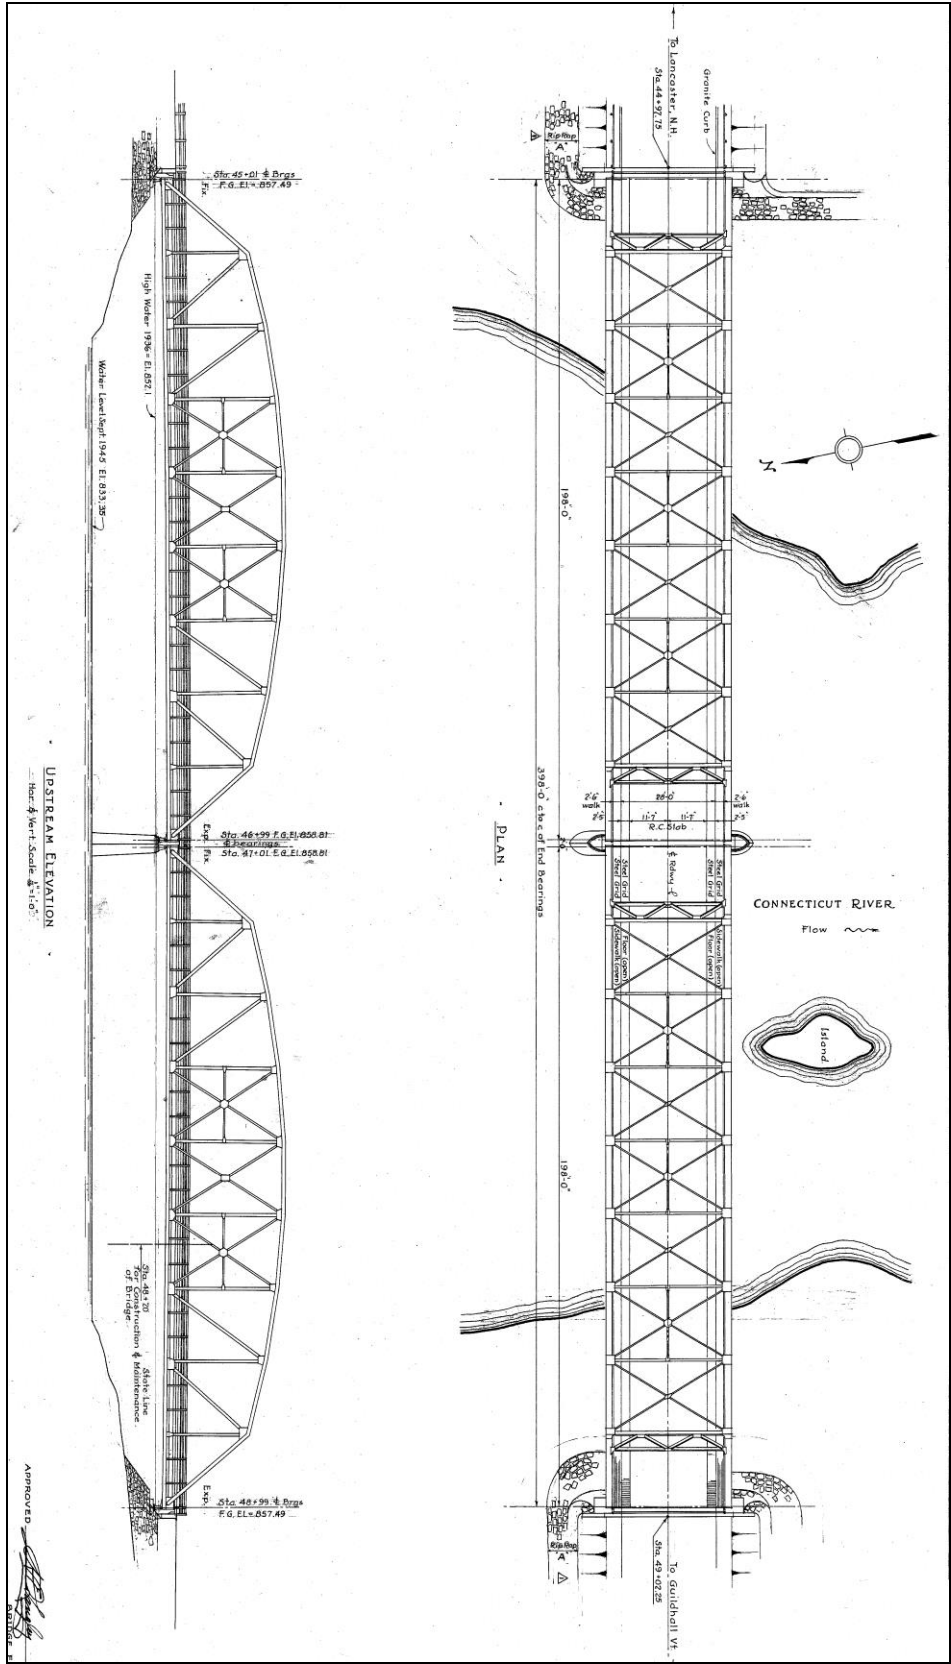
Rogers Rangers Bridge, built 1950, General Plan and Elevation. From original NHDH plans (File 2-10-1-1), sheet 1 of 10, March 1946 (NHDOT 1946).
